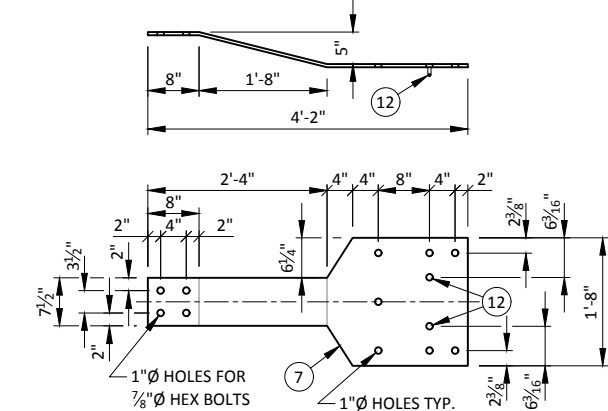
DETAIL AT END POST (THRIE BEAM RAIL ATTACHMENT)
